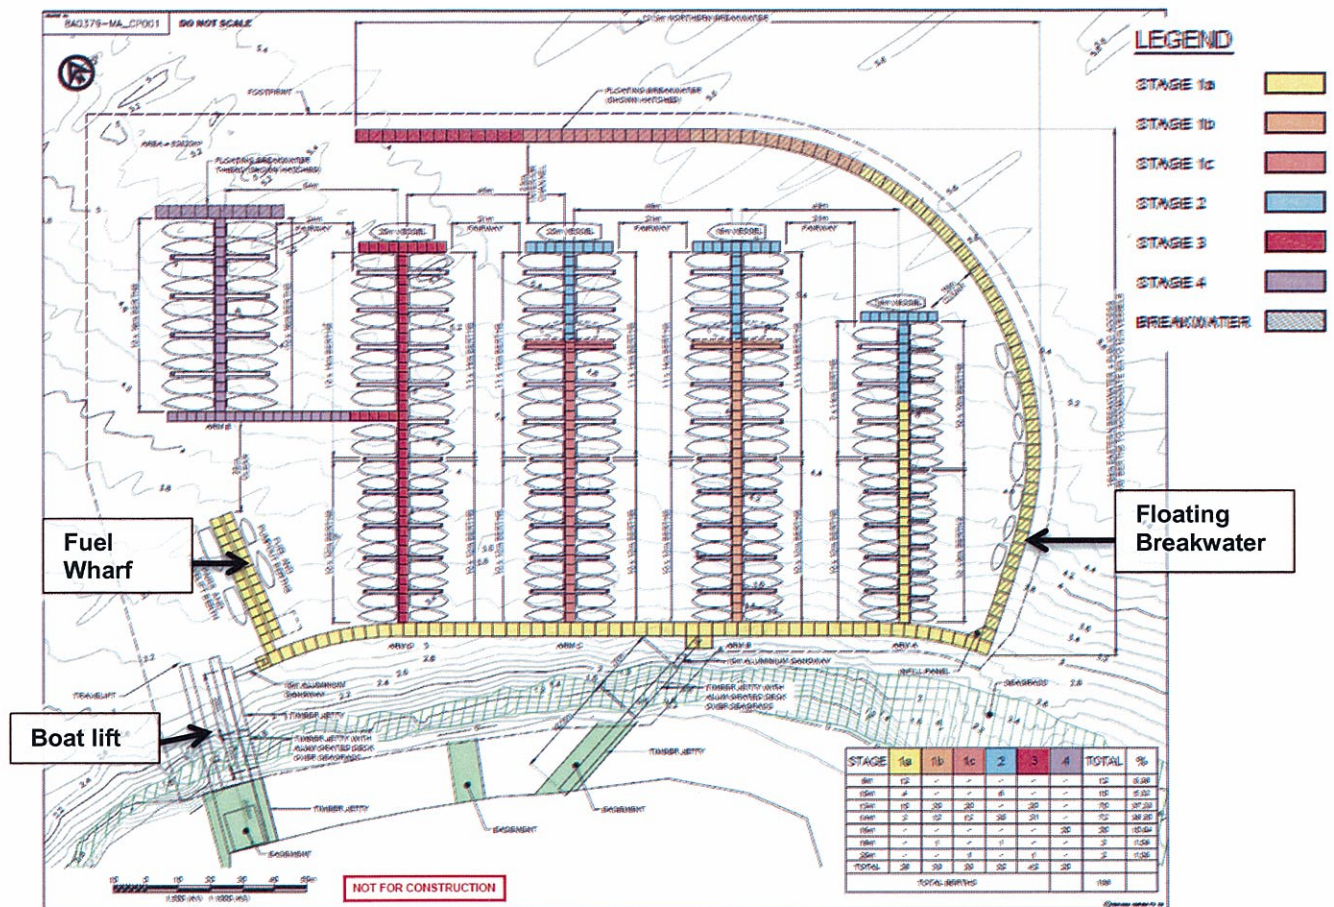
Concept Plan Marina Layout as Proposed Pursuant to Term B1
